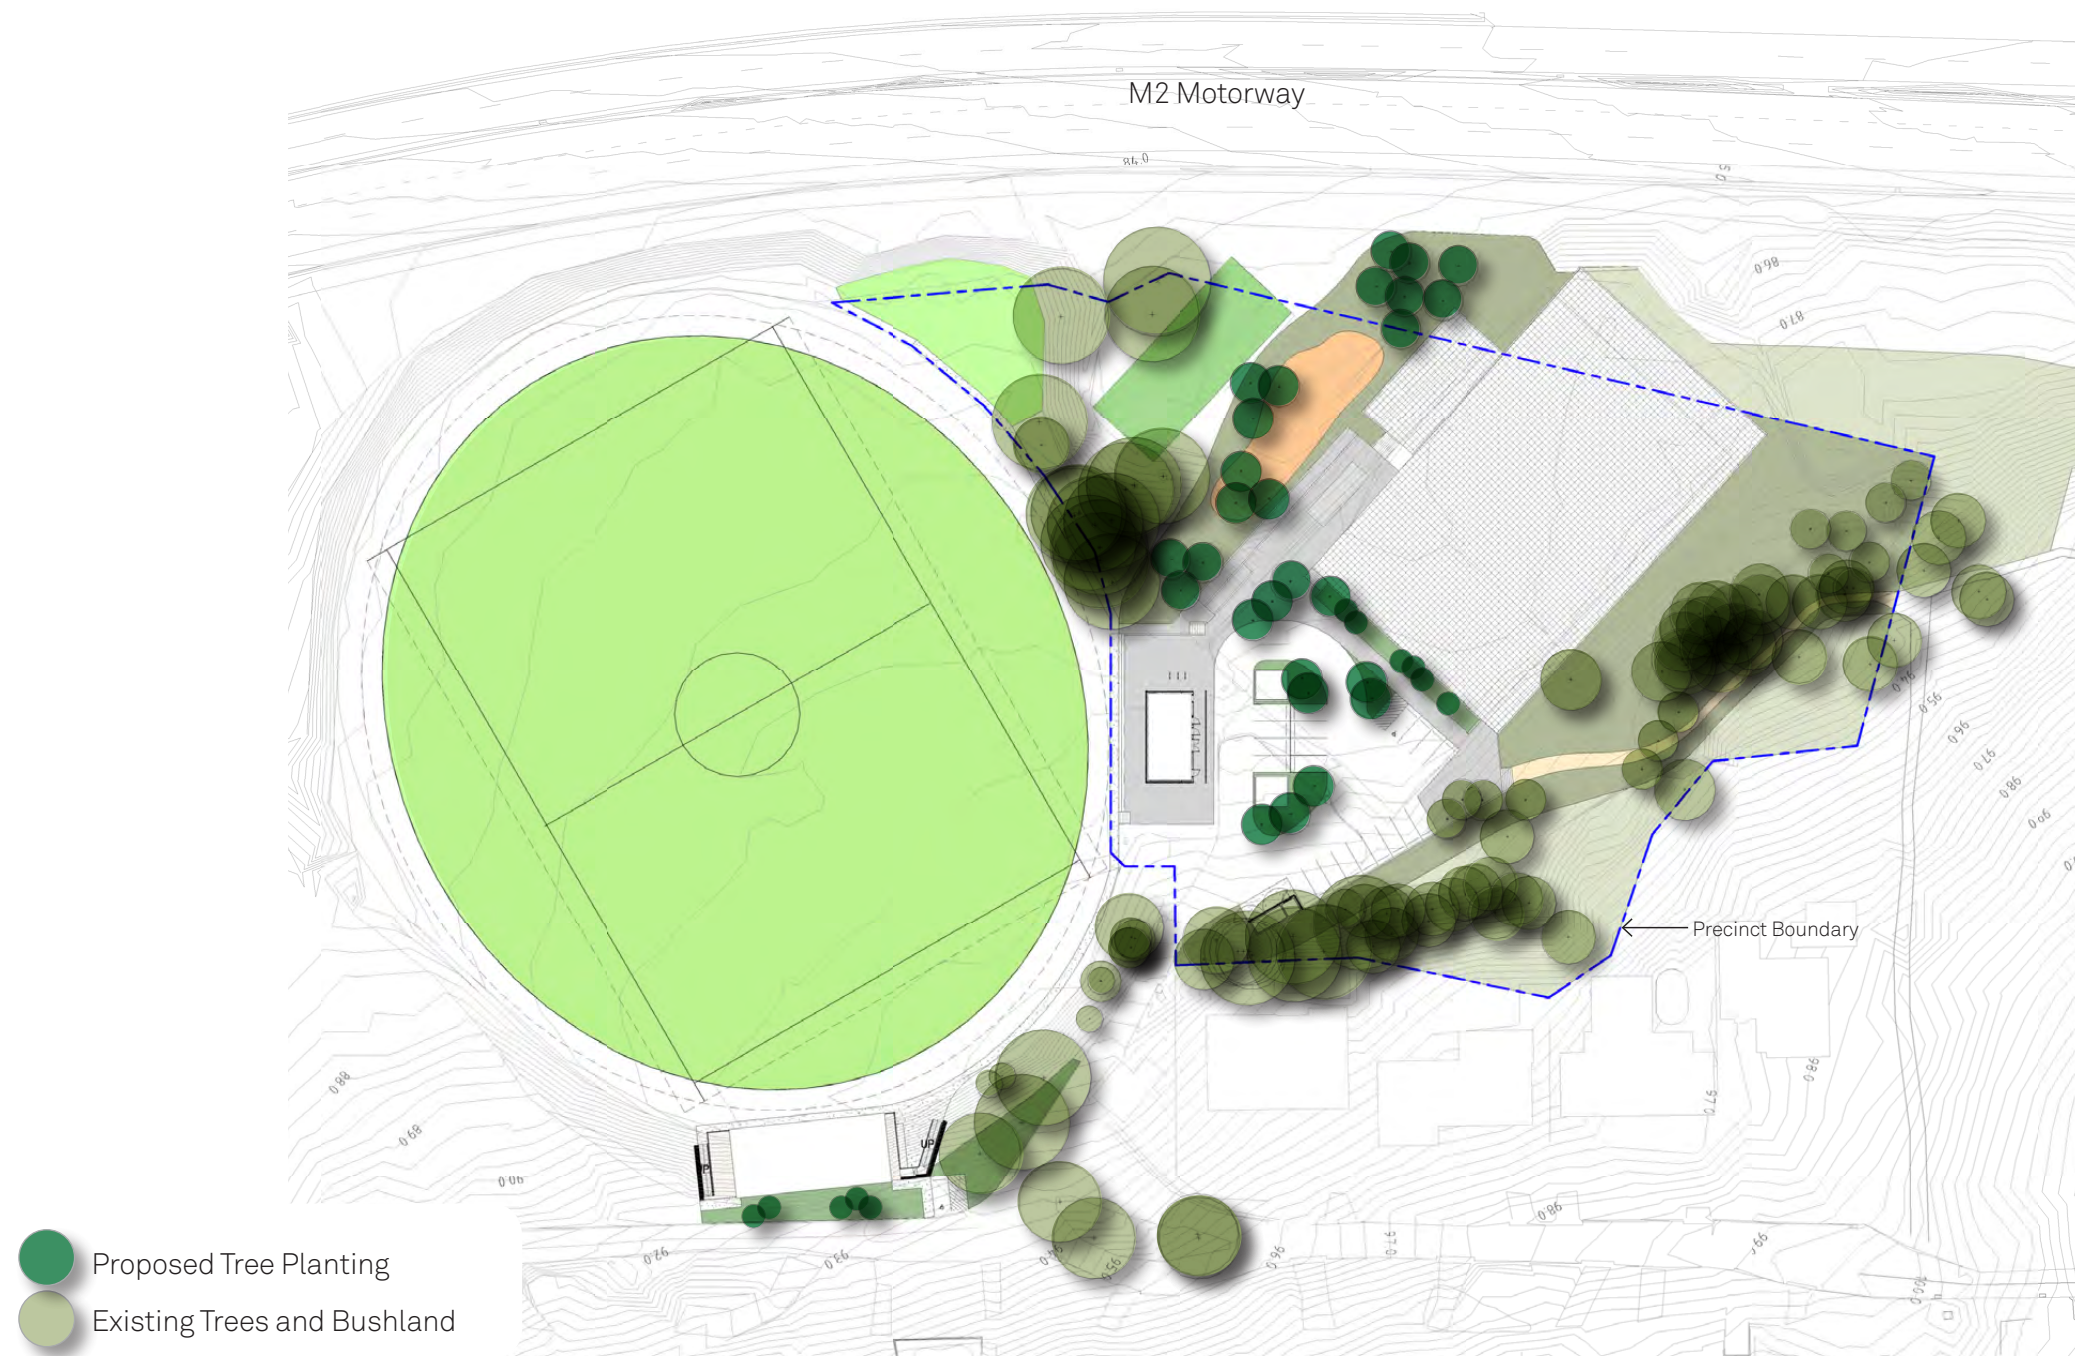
CSF_Cheltenham Service Facility Planting Plan .Source: HASSELL.
